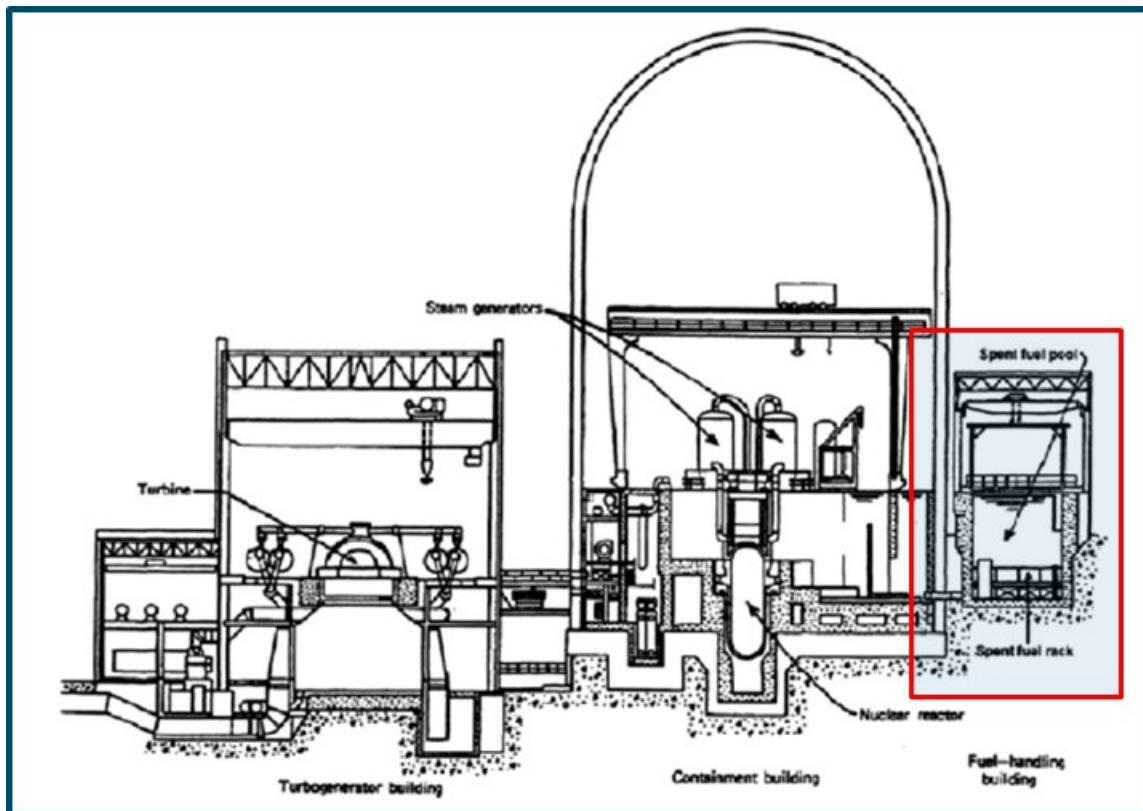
Schematic for Typical PWR Configuration with Spent Fuel Storage Pool
